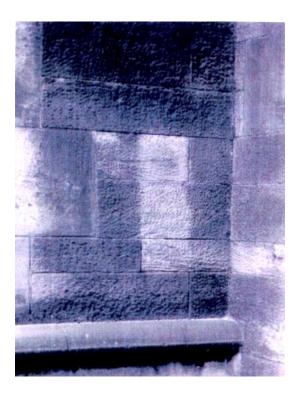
Example of test panel cleaned using low-pressure grit blasting.
